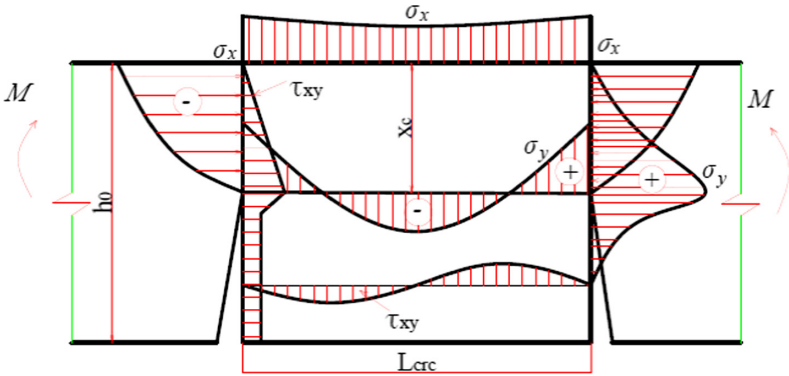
Stress state of reinforced concrete beams in the block between normal cracks
